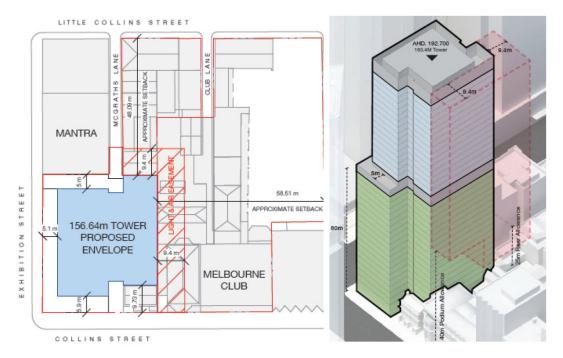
Diagram illustrating proposed airspace lots with light and air easements (Source: Applicant)
